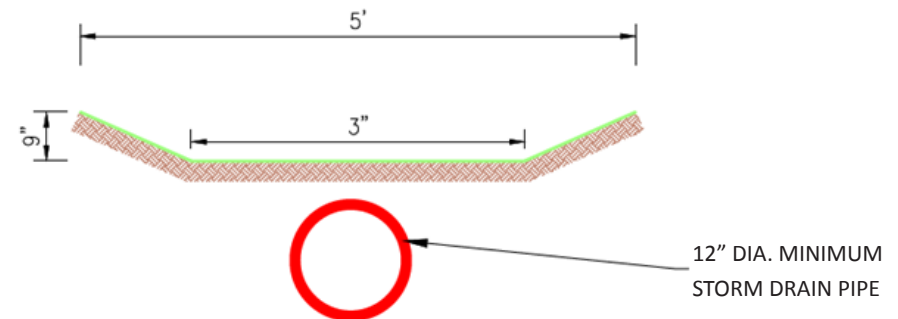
CROSS SECTION OF PLANTED SWALE
